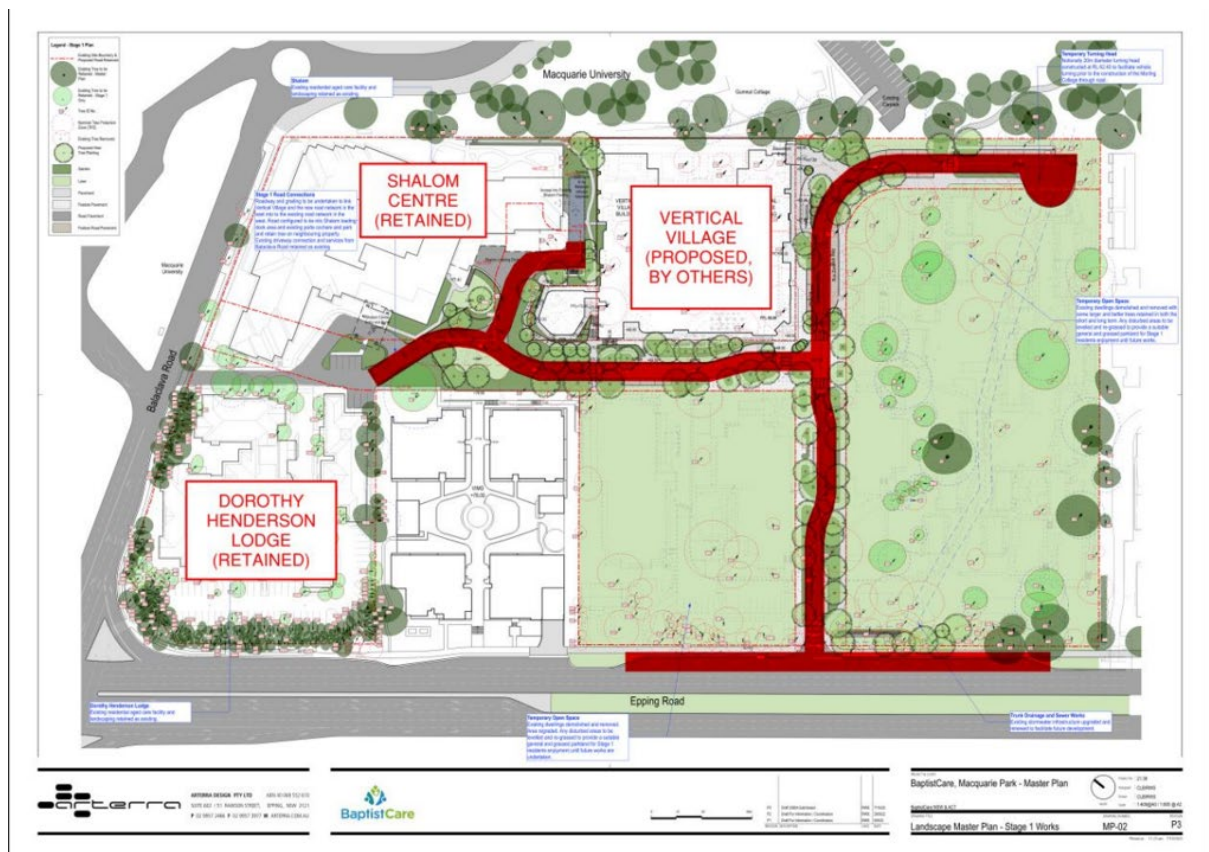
Proposed Stage 1 Road Works (Source: Appendix F page 8)
